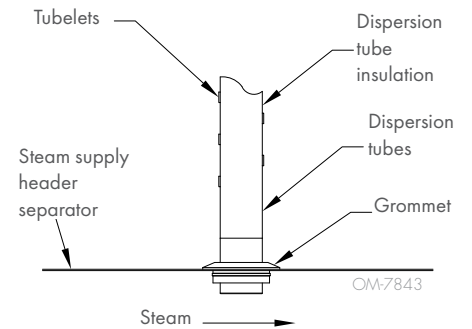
STEAM SUPPLY CONNECTION TO A BOILER
